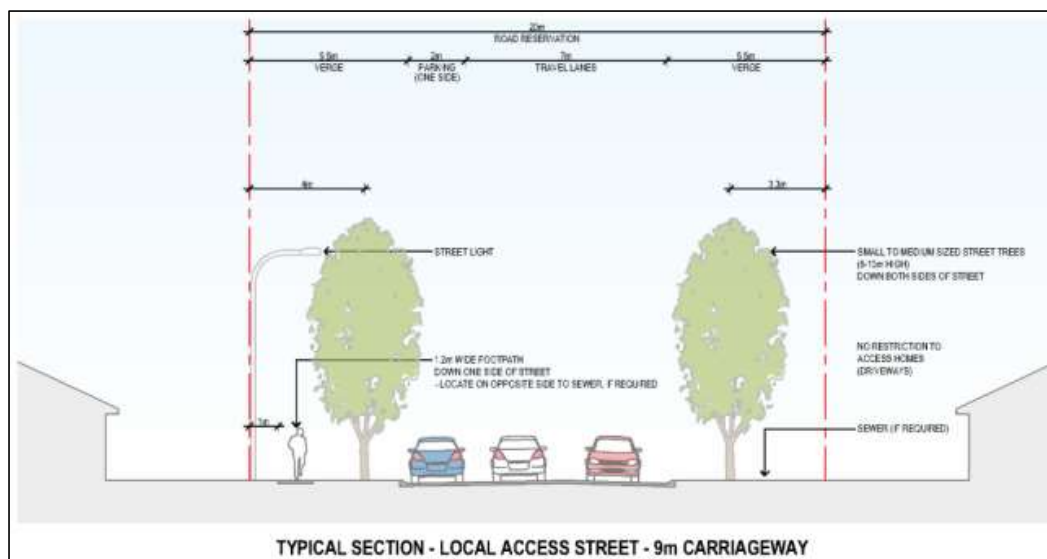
Typical Street Sections – Local Access Street (9m carriageway)
